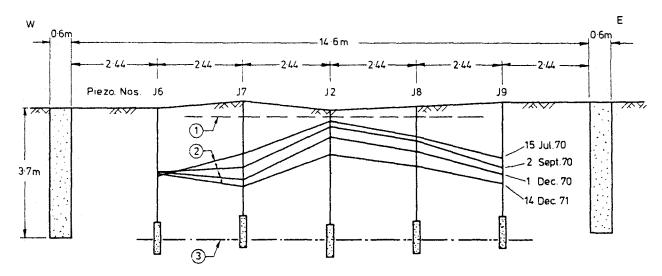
Cross-section of trench drain installation at Burderop Wood, Wiltshire, showing the effects of drainage at various times after installation (after Skempton, 1972).
